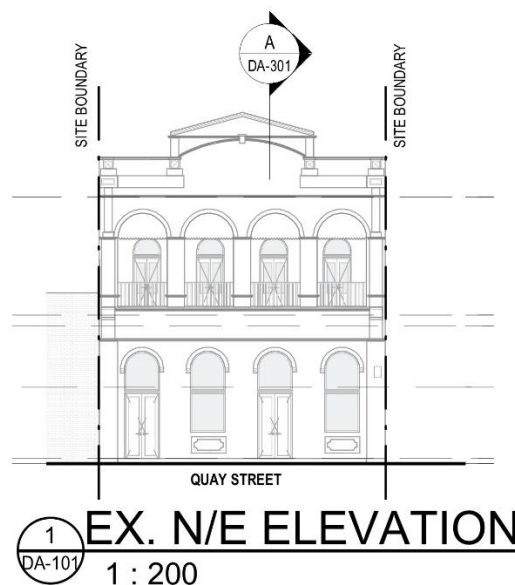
Existing North-East (Quay Street) Elevation showing that the primary façade of the subject heritage building will remain unchanged as a result of the proposed site redevelopment. (Source: Feather & Lawry Design)
